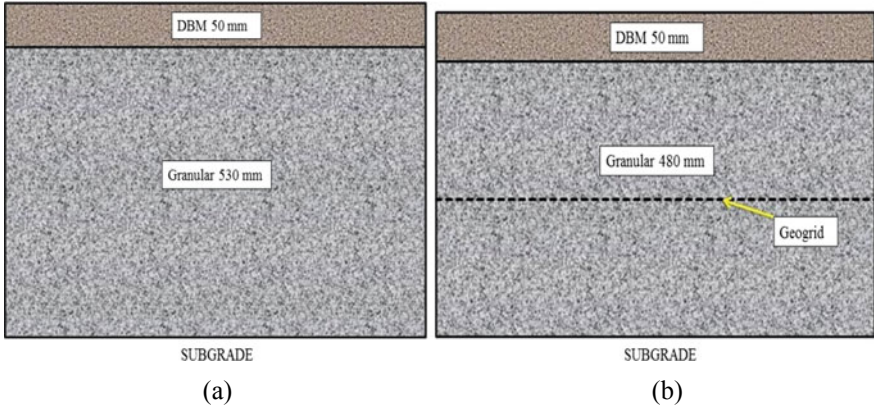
The cross-section for a control section and b geogrid reinforced section of Mandvi-Serulla state highway
